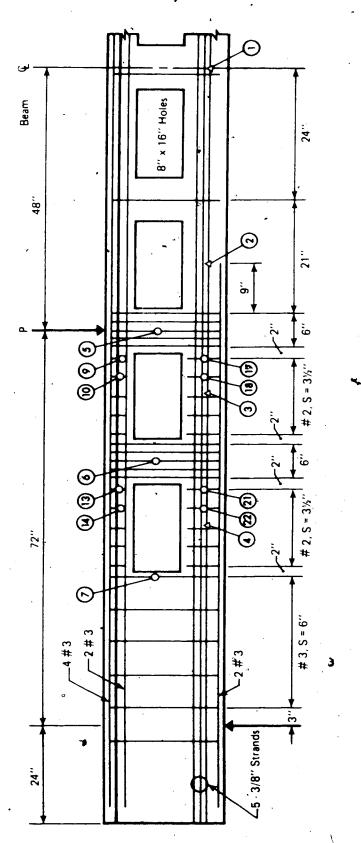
Reinforcement Details and Strain Gage Locations for Beam 7-16-6
